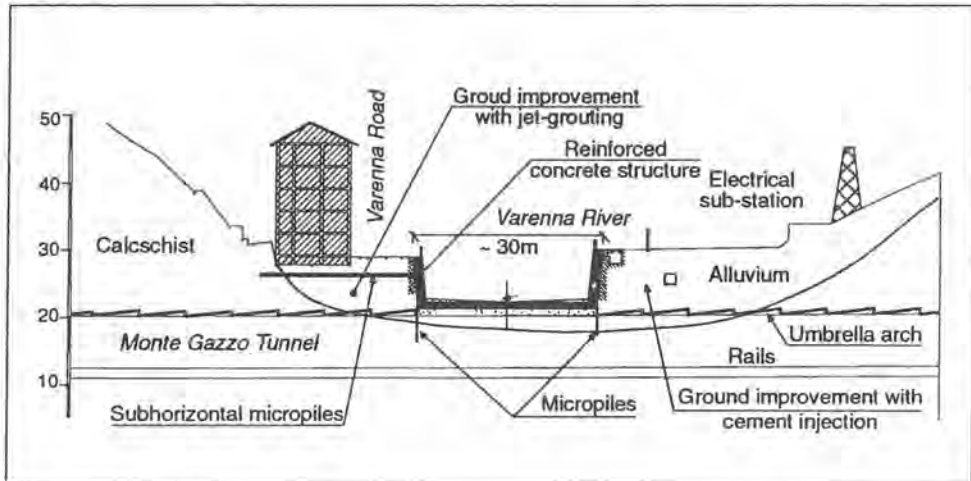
Varenna Underground crossing. Construction scheme.
